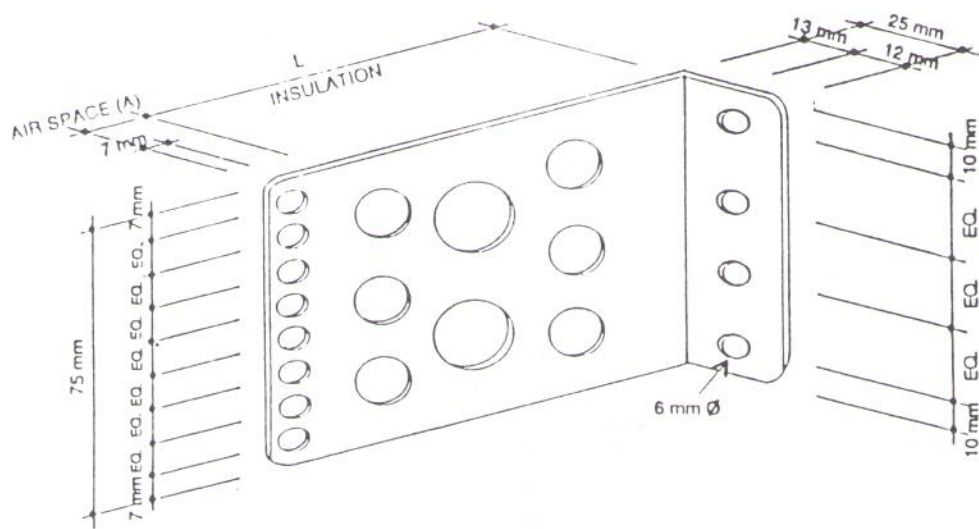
Dimensions of the shear connector plate used to attach to the flange of the Steel Stud
